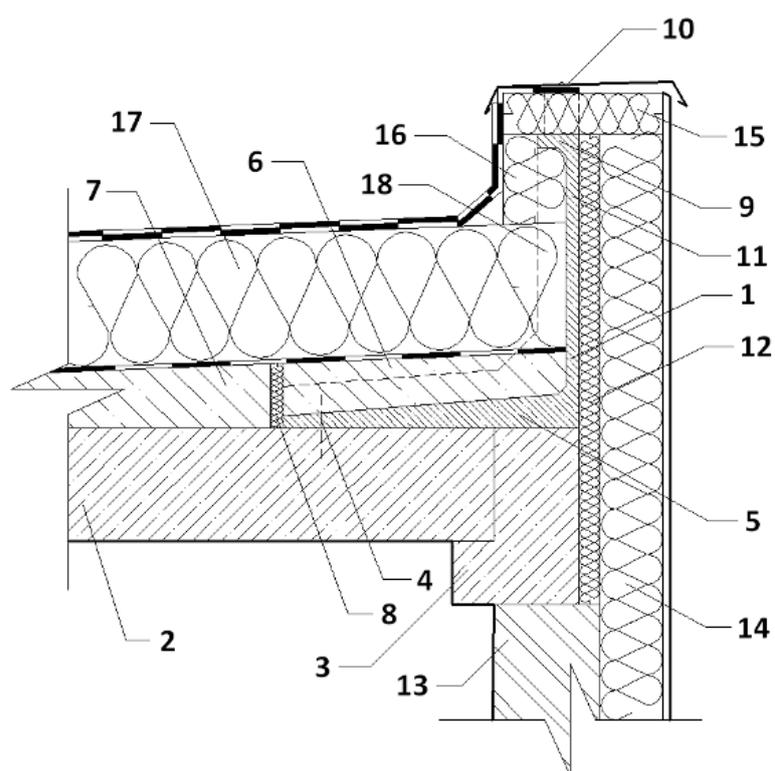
Example of parapet block installation on the ceiling structure of precast concrete frame construction system. *Notes:* 1 - parapet block, 2 - reinforced concrete ceiling panel, 3 - reinforced concrete beam, 4 - anchoring of parapet block, 5 - horizontal part of parapet block, 6 - monolithic concrete - layer forming a gradient and stabilizes the parapet block, 7 - monolithic concrete - layer forming a gradient, 8 - dilatation, elastic strip, 9 - the upper part of the parapet block, 10 - anchoring of parapet block, 11 - vertical part of parapet block, 12 - lower thermal insulation layer (compensation for reinforced concrete elements), 13 - filling masonry of perimeter wall, 14 - main thermal insulation layer (ETICS), 15 - insulation of parapet extruded polystyrene (XPS), 16 - insulation of parapet block, 17 - conventional roofing layers of flat roof, 18 - reinforcing rib of parapet block
